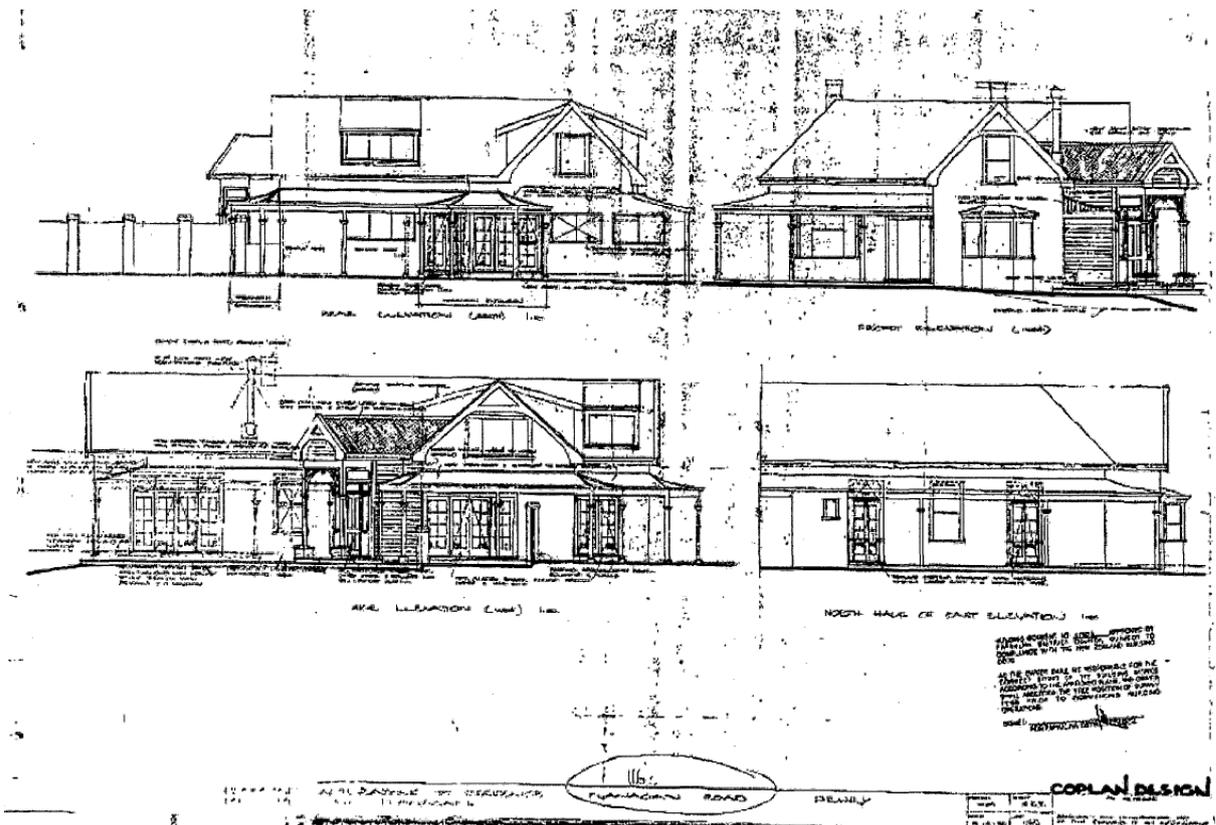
Auckland Council Property File 596592 General Property File- Plan, 1986 alterations.
